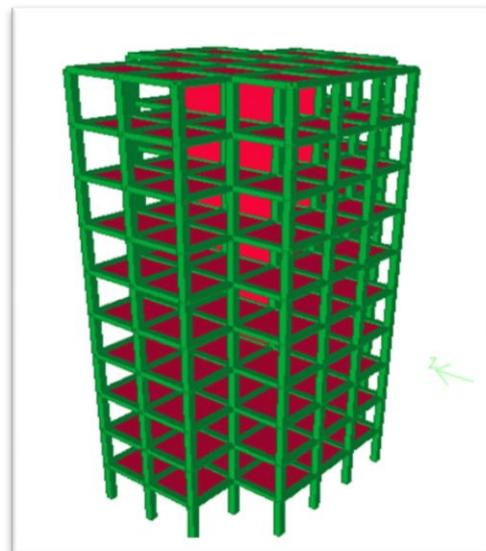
STRUCTURE WITH INNER SHEAR WALL
